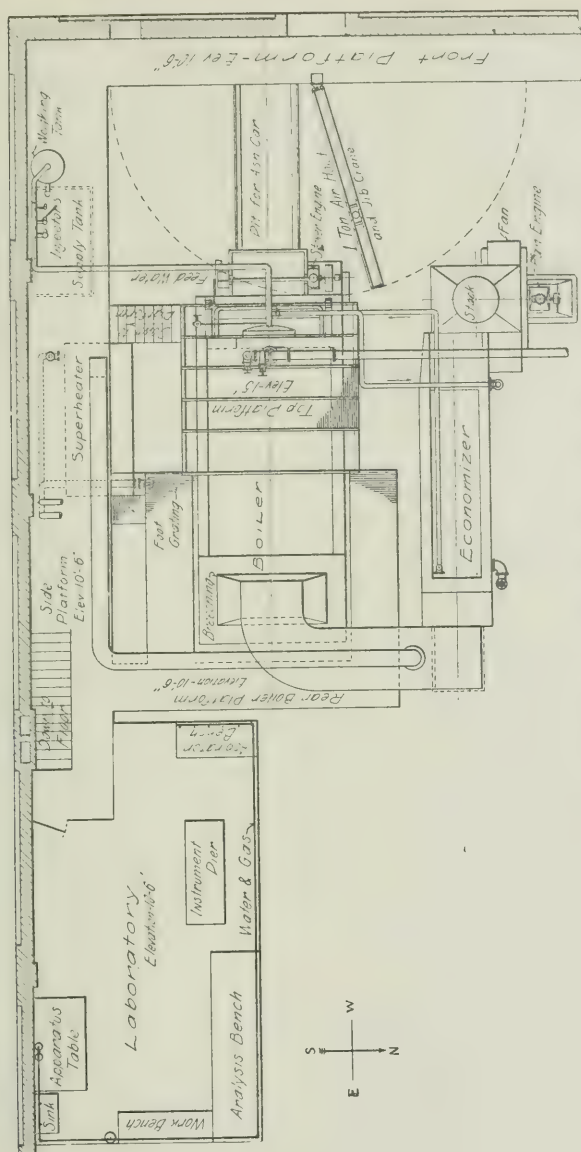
GENERAL PLAN OF THE TESTING PLANT.
